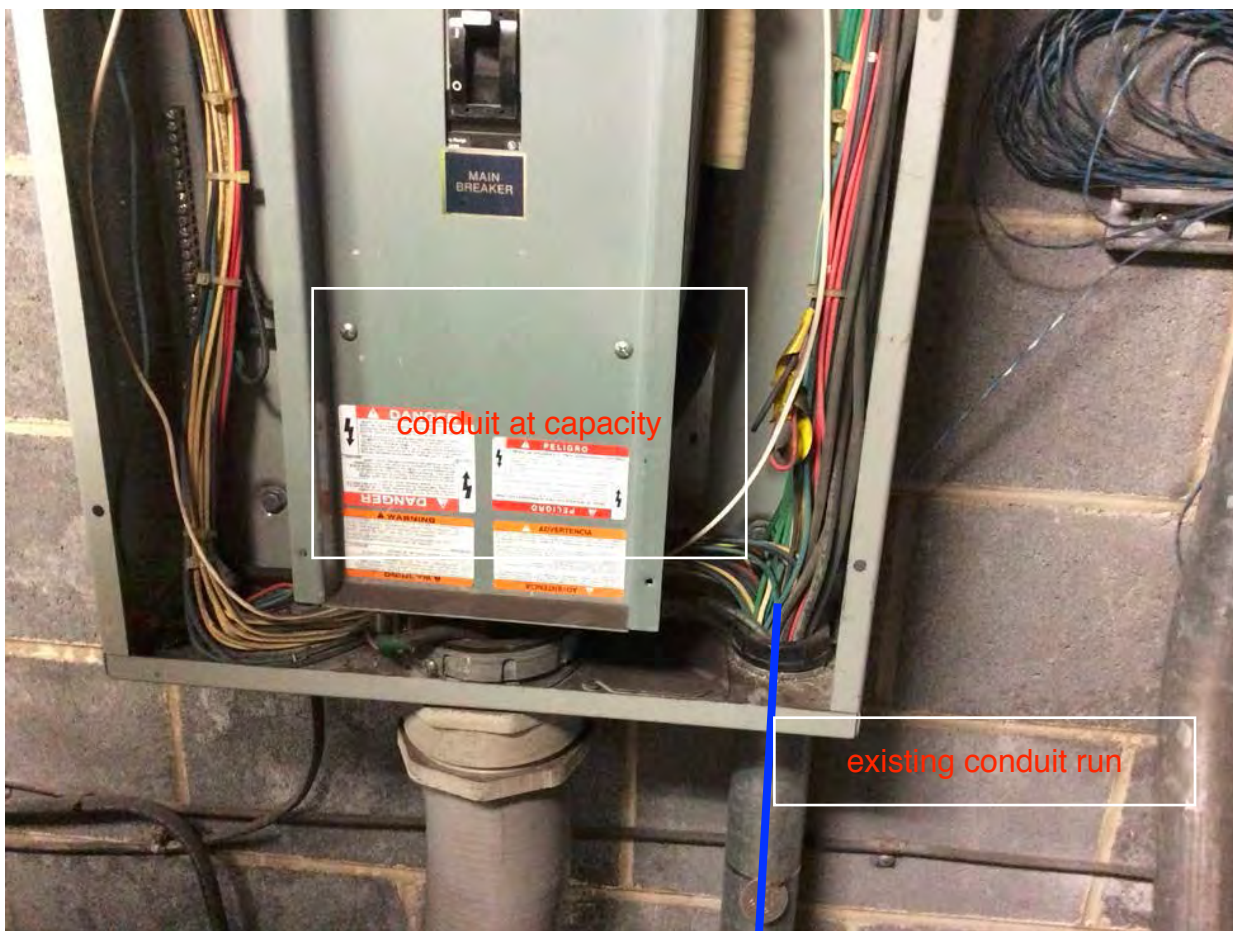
E05 Georgia Avenue: AFC panel with proposed conduit run from handhole 1
